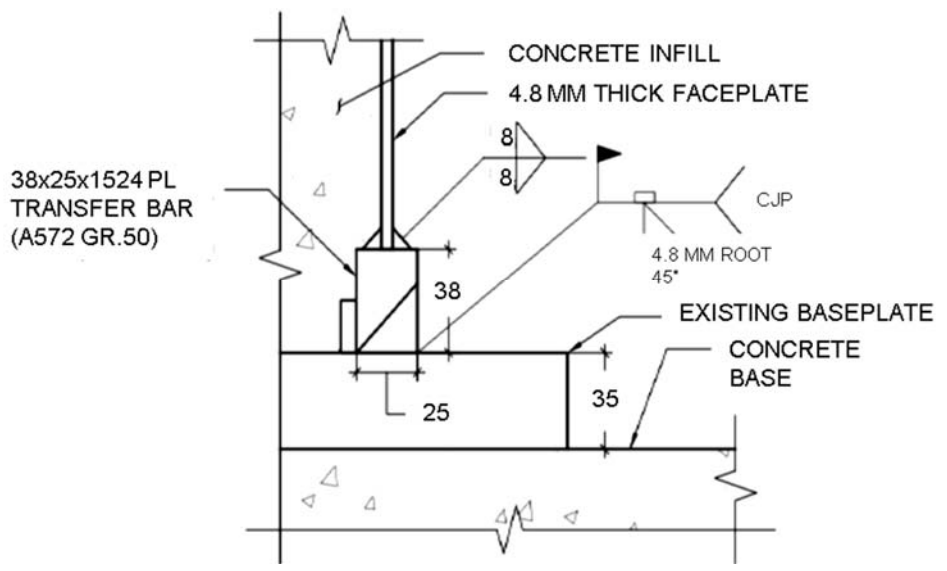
Faceplate-to-baseplate weld details (from [33])
